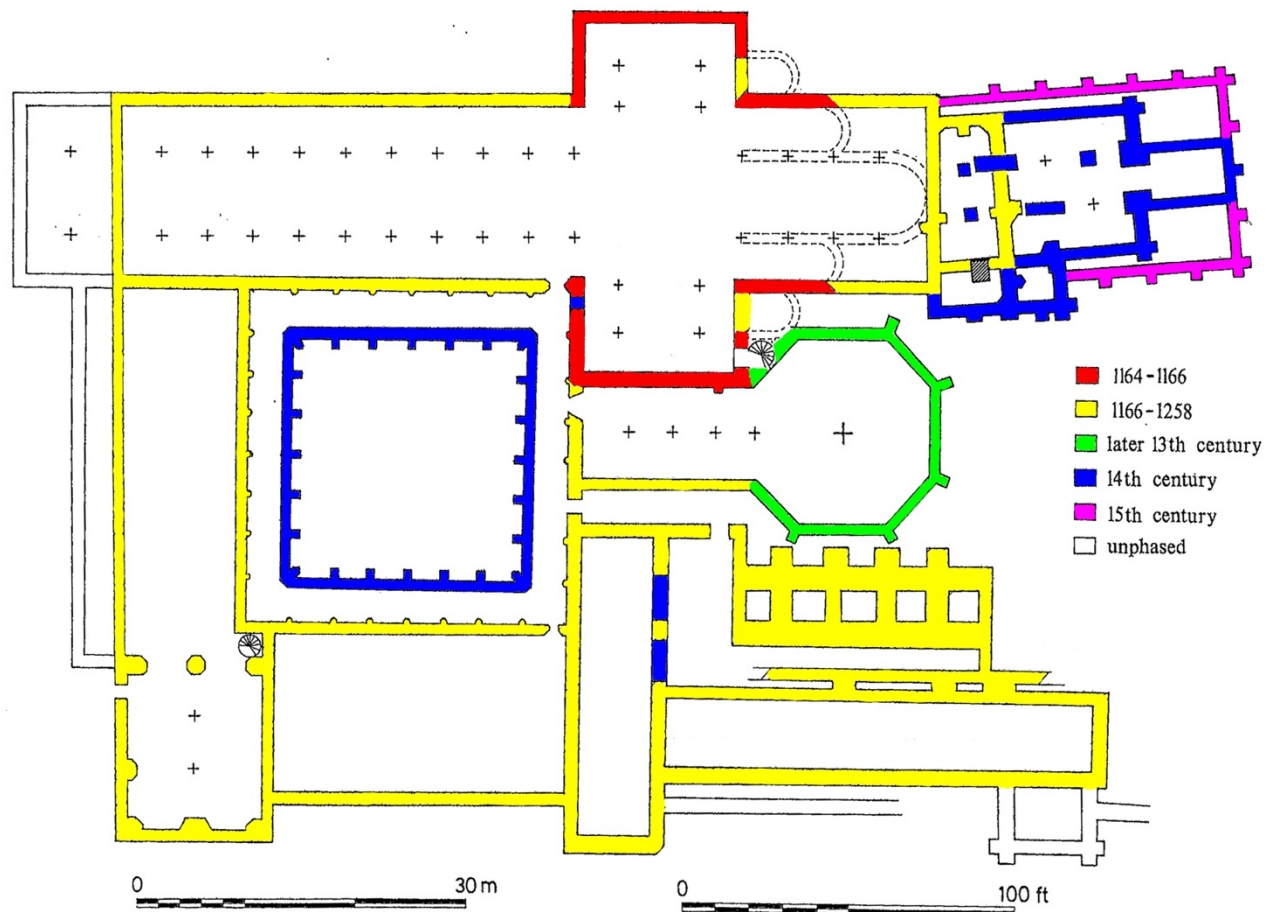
Proposed plan with dimensions of Walden Abbey, with periods of construction highlighted (Harris, 1997, 40). © English Heritage.
